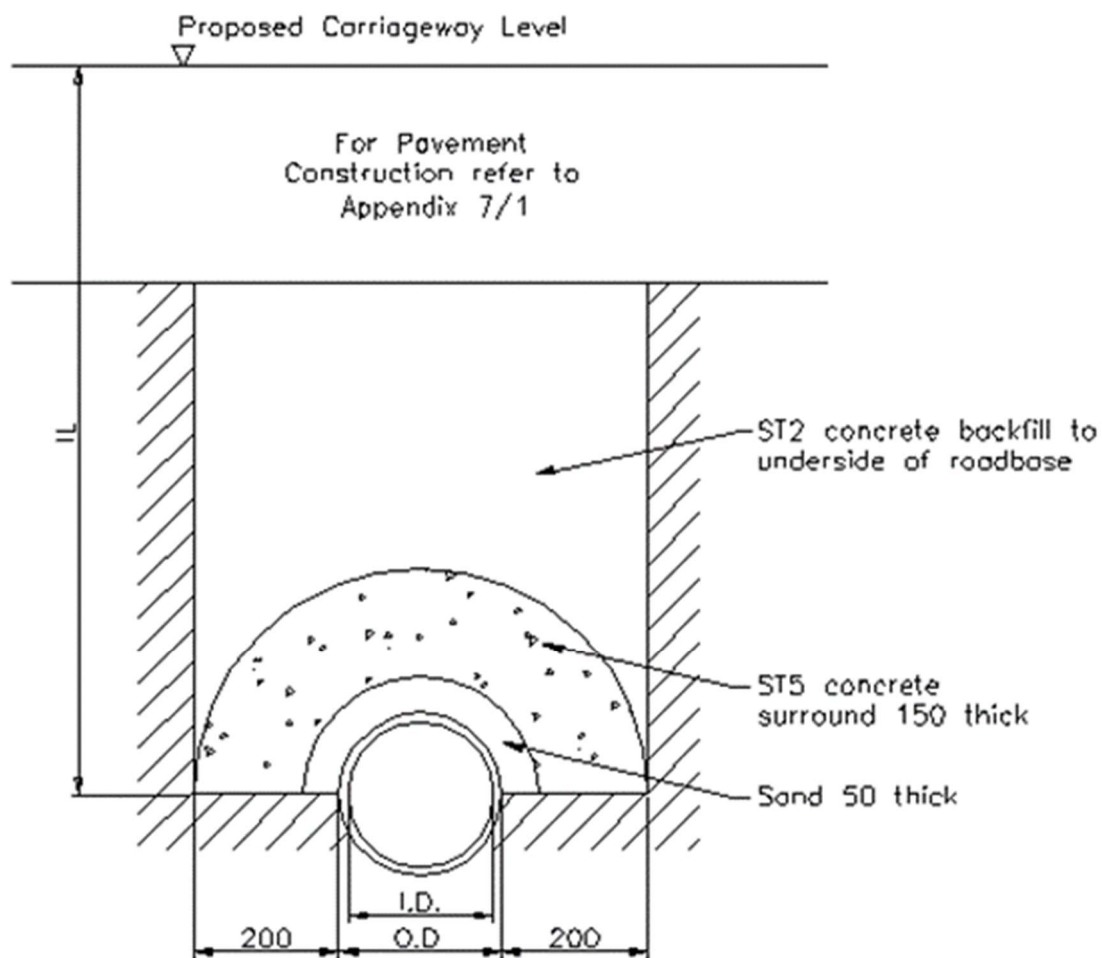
Concrete protection to existing drains, service ducts or service mains
